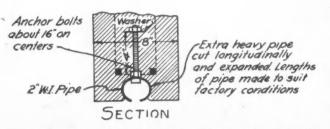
Cross-Section Showing Split Rod Iron Pipe Cast Into Lower Face of Concrete Girder.
